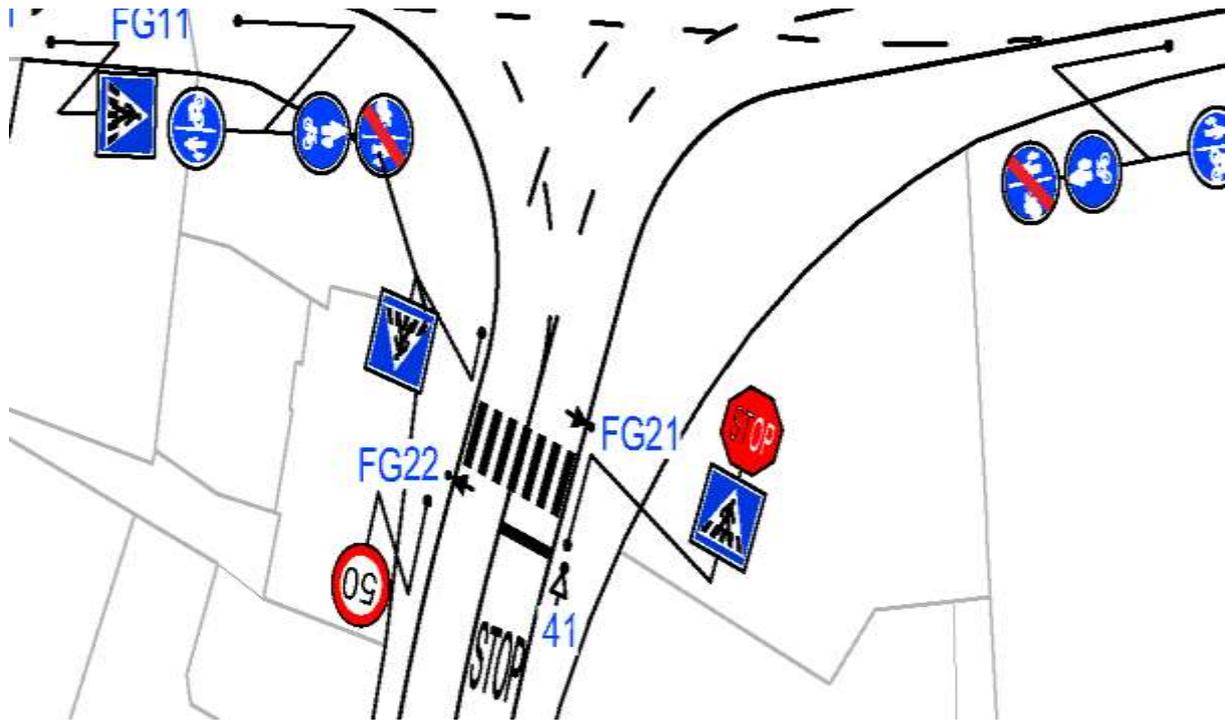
Layout of intersection Bahnhofsstraße/Klagenfurter Straße
